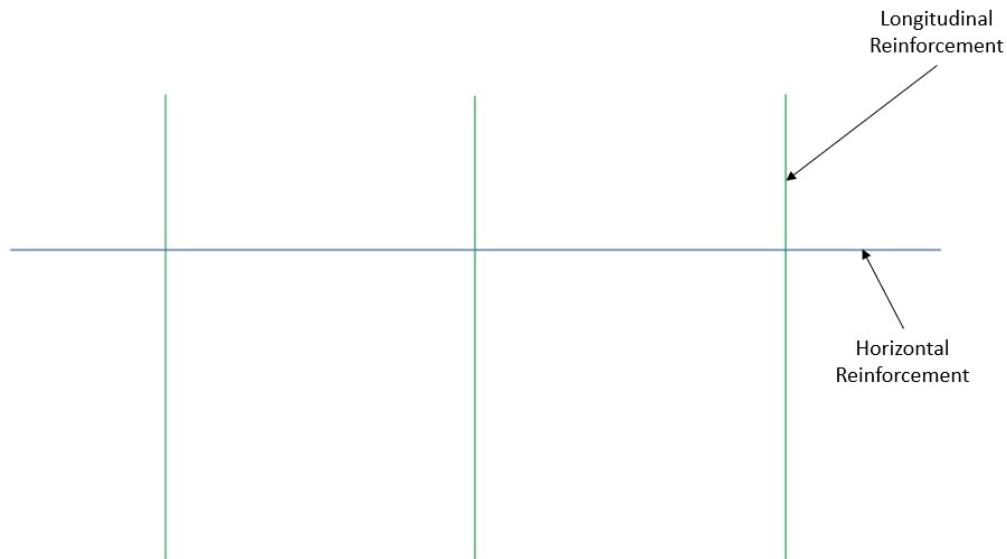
Reinforcement Layout for out-of-plane loaded walls
